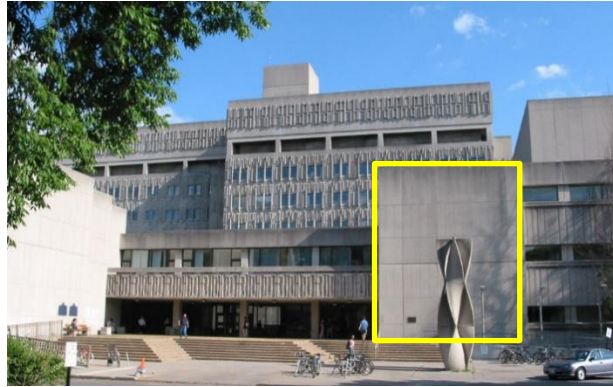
Partial North Elevation of MSB (Stair 9 highlighted in yellow outline above)
